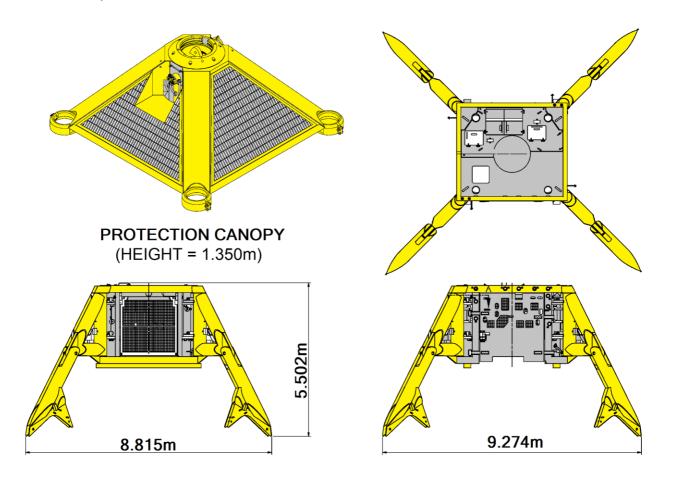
Elevation on WHPS for well P1 & W1 (protection cover not shown)
